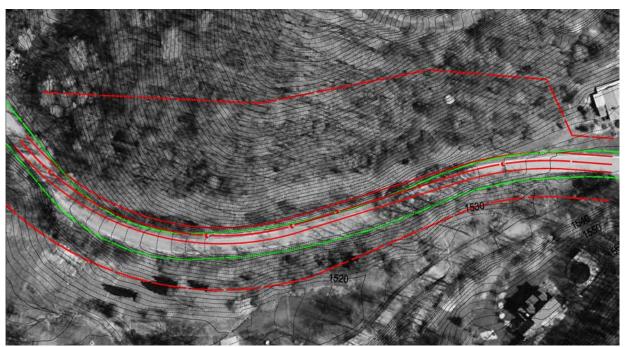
Plan View of Bell Hollow Curve Realignment on Poplar Grove Road
